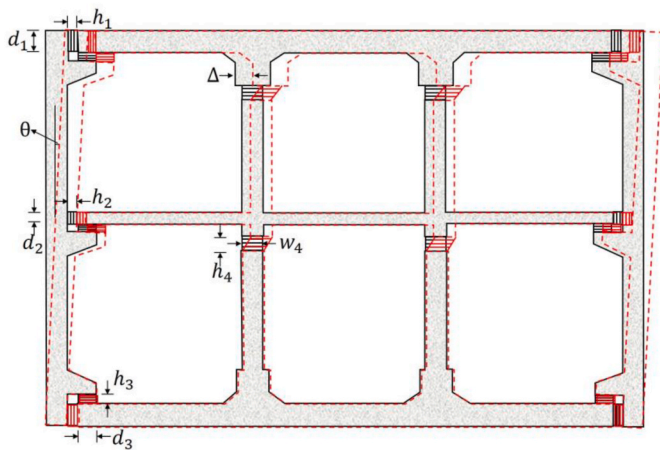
The detailed sectional dimension of the sliding-hinged subway station.
